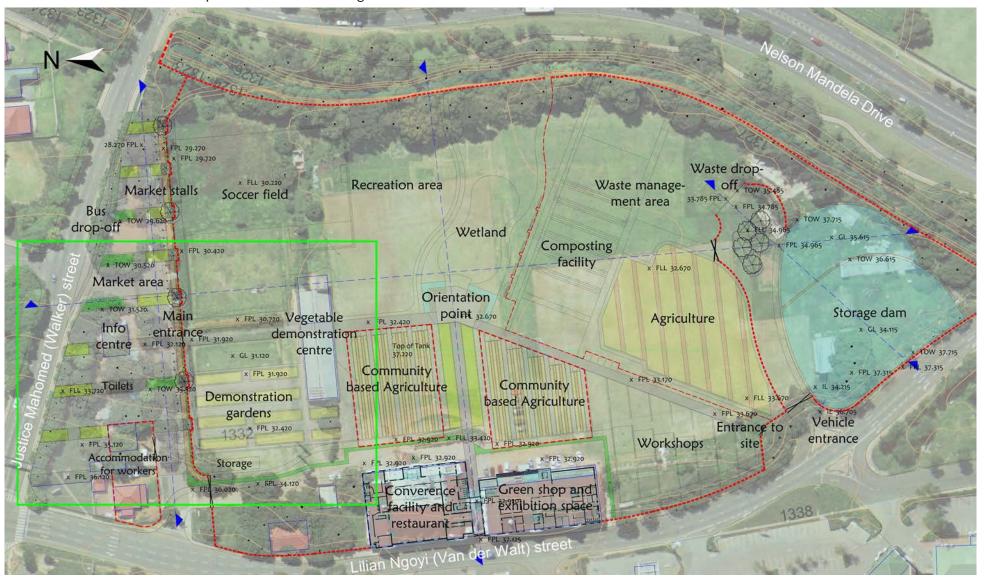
Master plan development 7 (Author, 2012) - Due to practical reasons the layout of the site on plan will be developed further in landscape format (rotating the layout of the site 90° counter clockwise)
